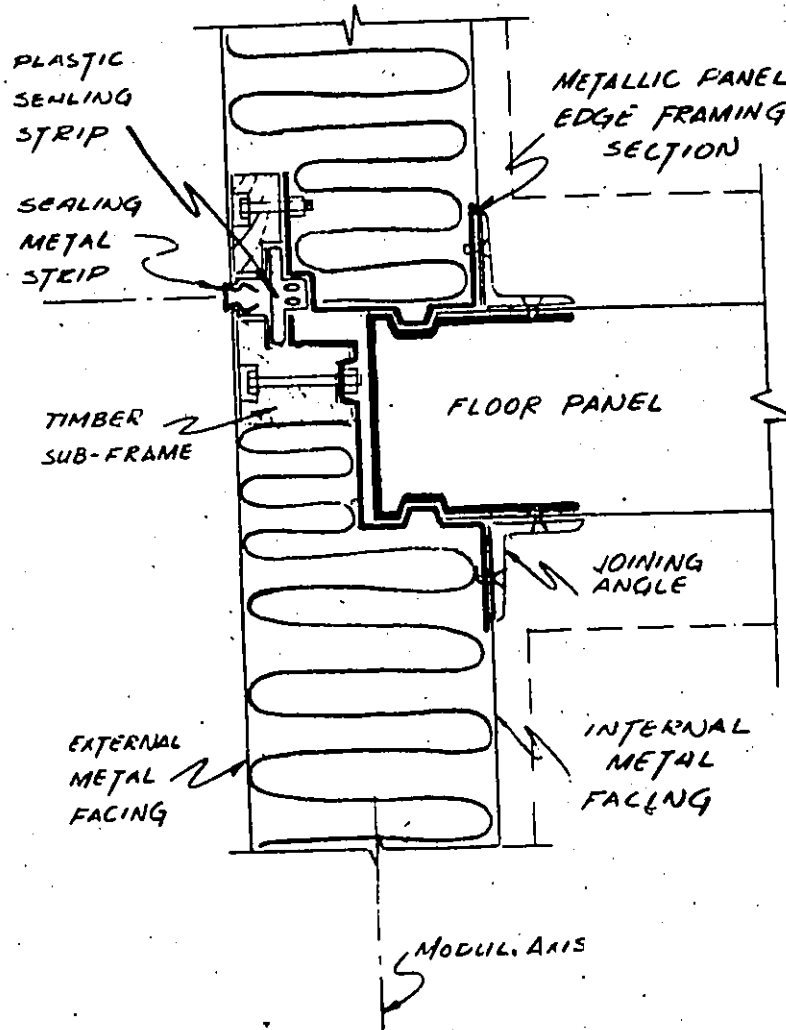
HORIZONTAL JOINT, EXTERNAL WALL PANELS
